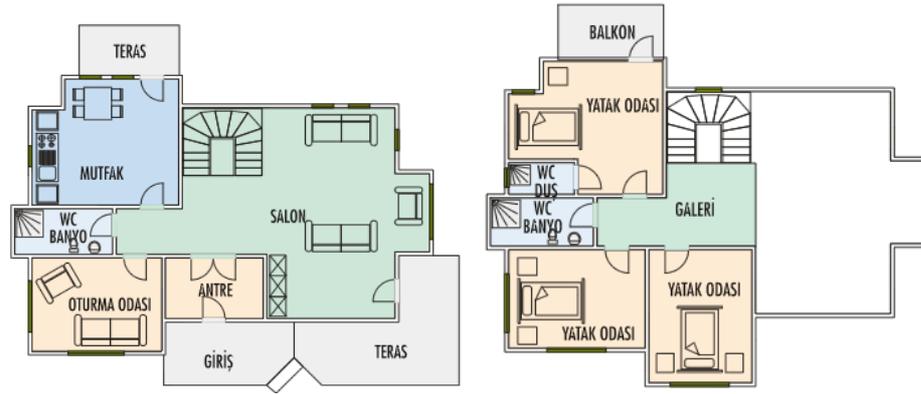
Bolu Kiosk - Ground floor plan 116m², First floor plan 90m²
